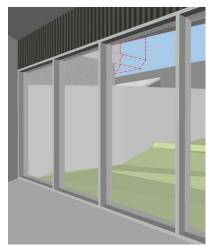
Proposed outlook from kitchen window of 26 Birrell Street
